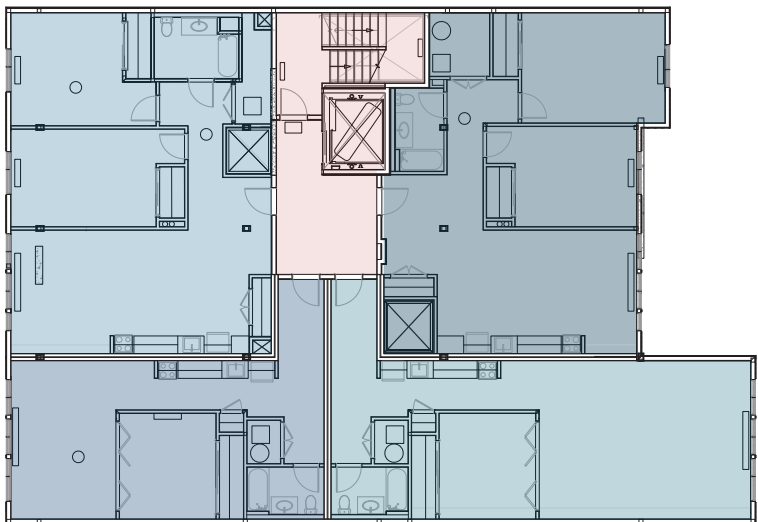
Upper level plan showing 1 & 2 br units ("Plan Review No. 63480, Automatic Fire Sprinkler and Standpipe System - Nem, Rainier Ave Mixed-Use" 2017).
